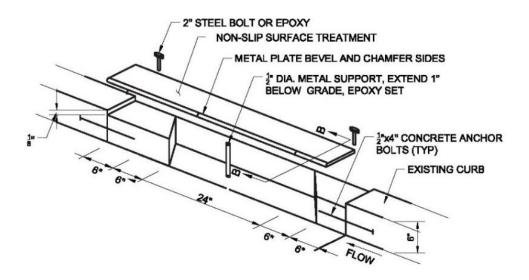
Curb opening example – vertical and horizontal cuts on existing curbs
